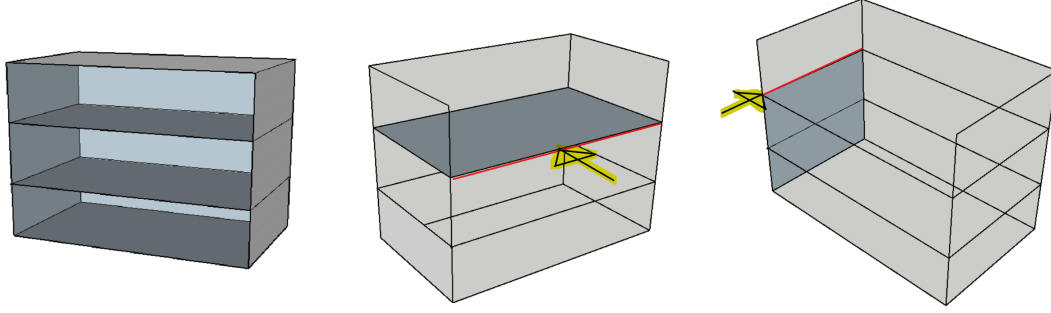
Example building explaining calculations for relative stiffness of the second floor. Left: Showing all shear walls and floor slab. Middle: Showing floor slab with unit load. Right: Showing shear wall with unit load.
